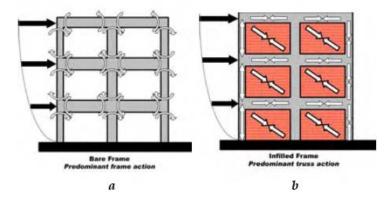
Masonry infills alter the seismic response of a frame structure: a) bare frame; b) diagonal strut mechanism (Source: Murty, Brzev, et al. 2006<sup>1</sup>).
